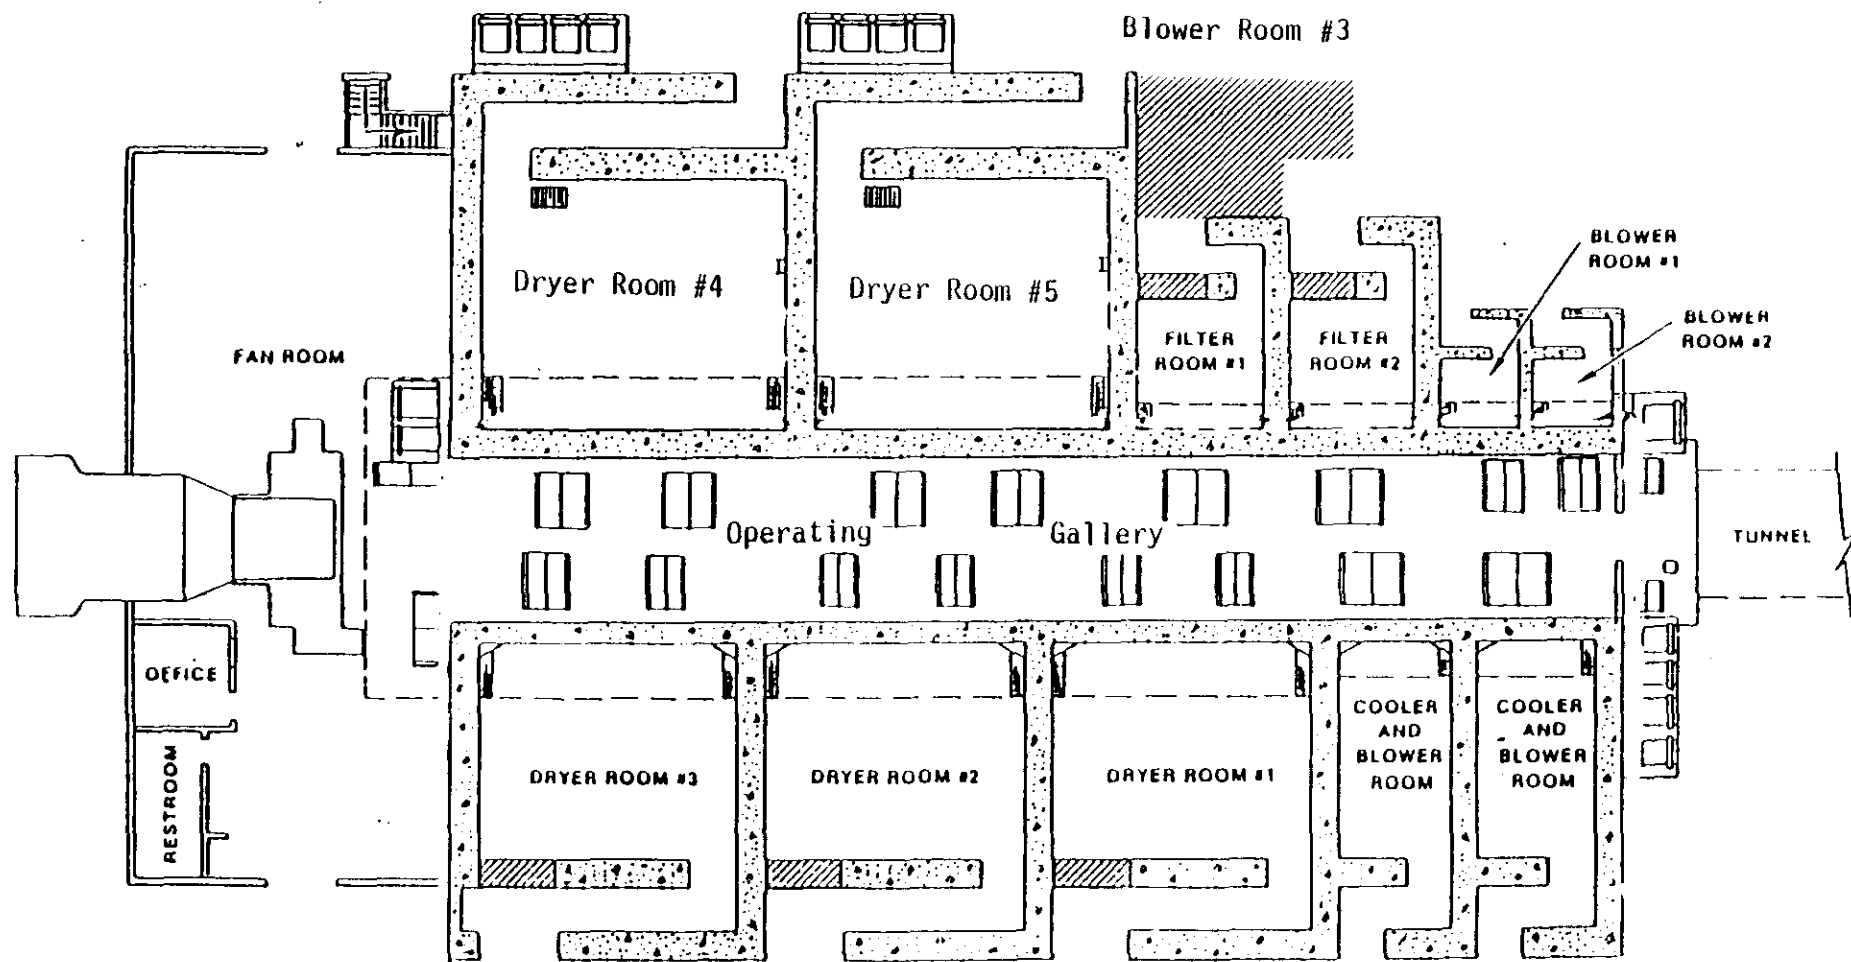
Plan View of 115-D/DR Gas Recirculation Building.
